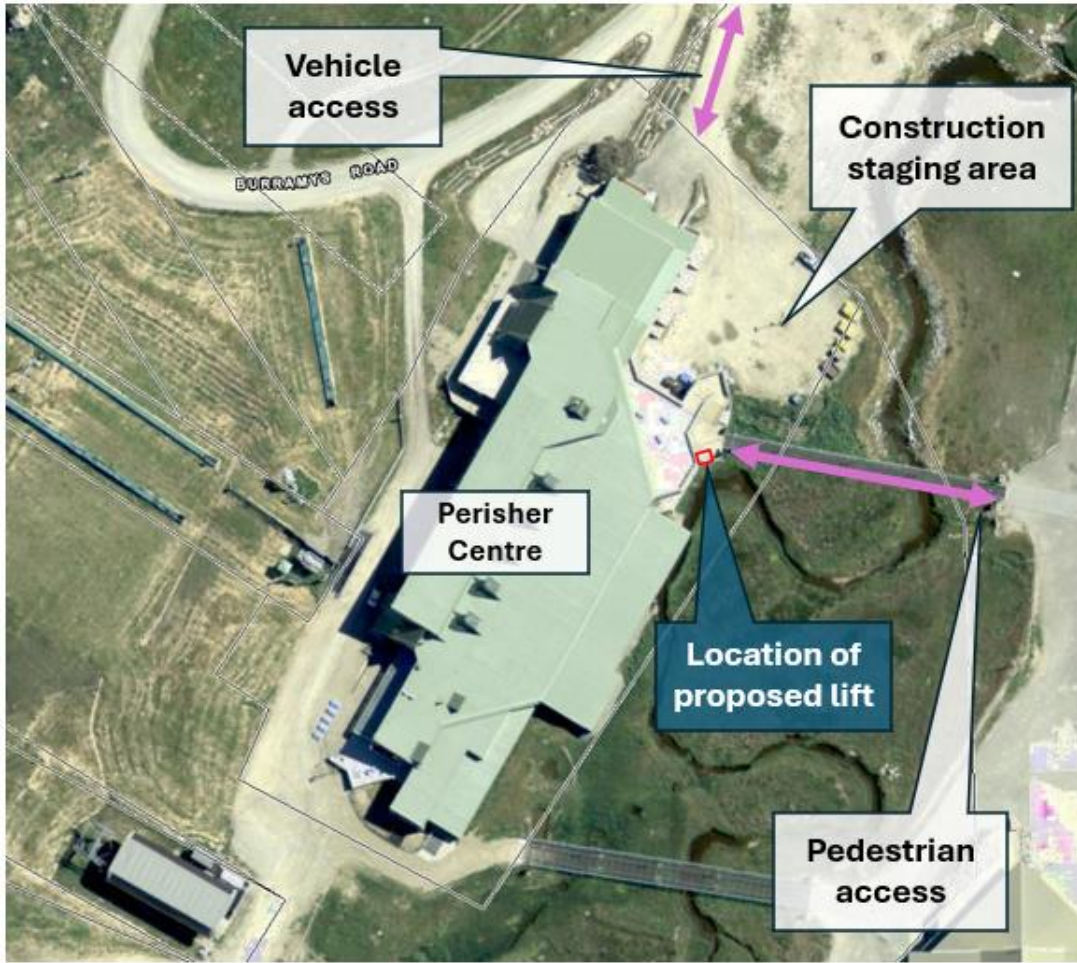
| Aerial photo identifying the site access and construction staging area. The site of the proposed lift is outlined in red (Source: Six Maps 2024, with DPHI annotations)
